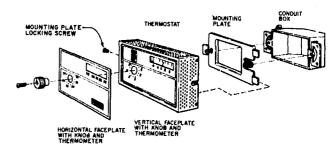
Line drawing illustrating method of mounting a vertical thermostat to a horizontal outlet box and installing a horizontal faceplate.
